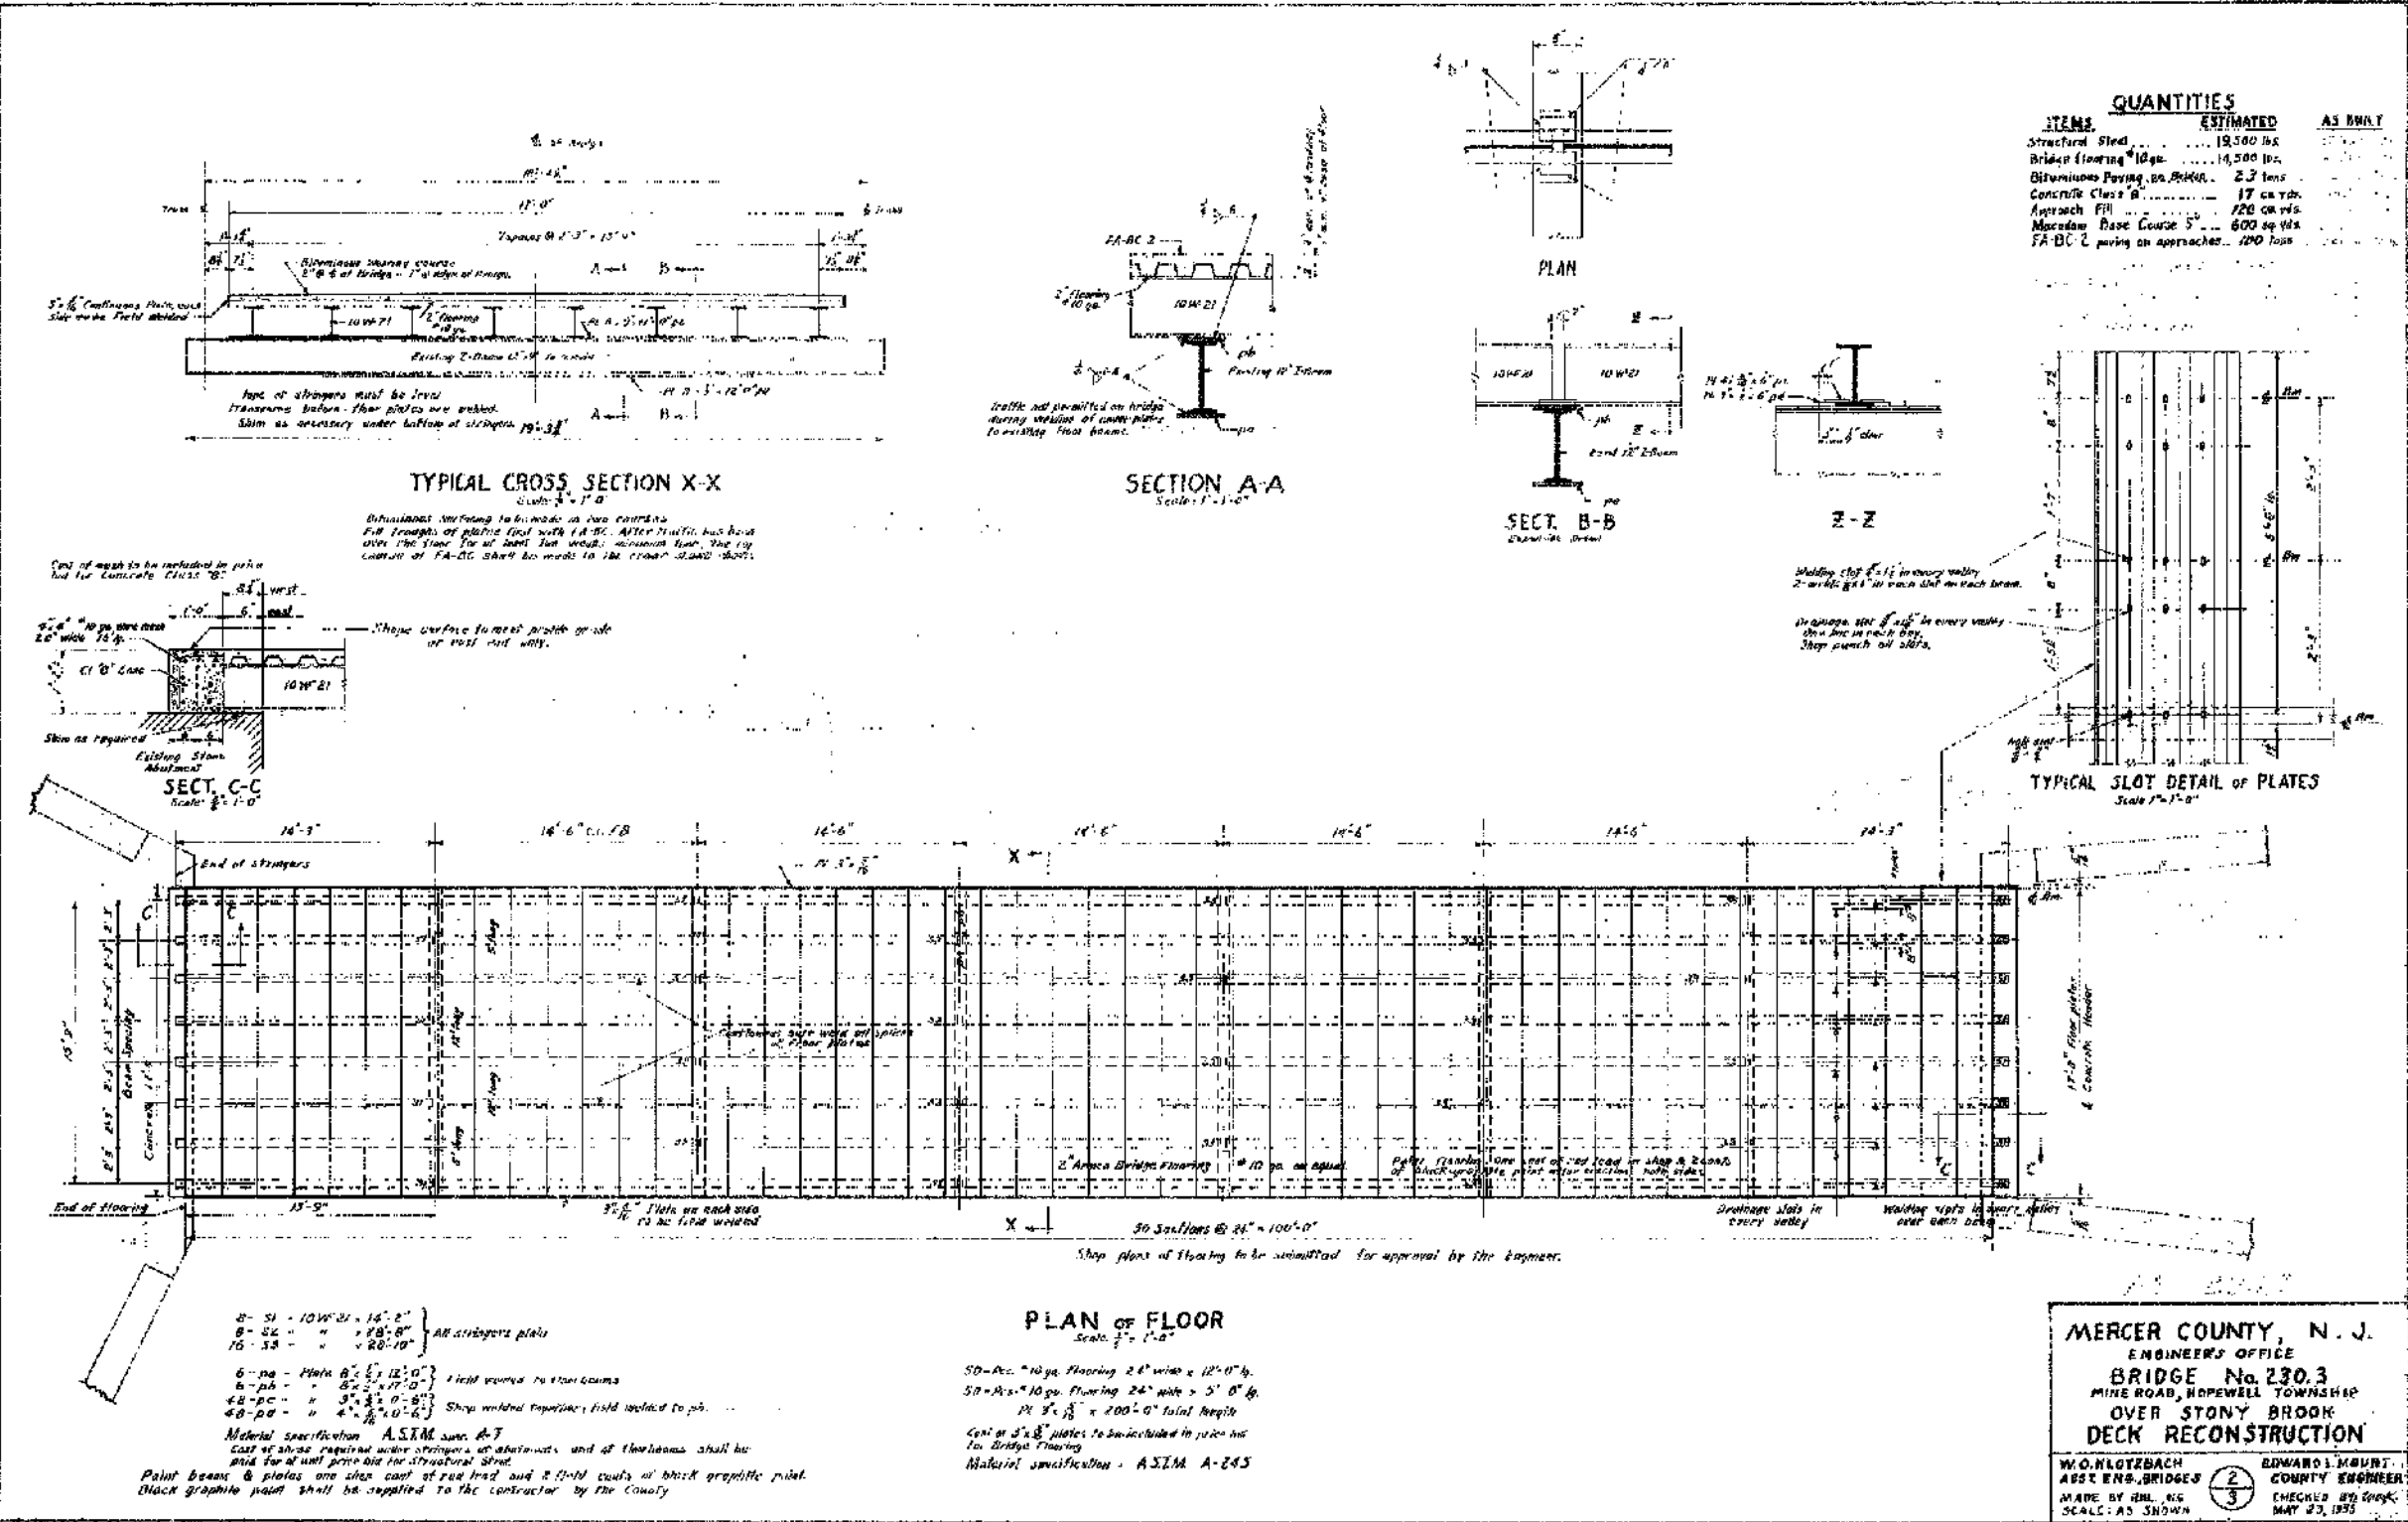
1955 As-built plans for the Bridge 230.3 deck reconstruction (Source: Mercer County Division of Engineering Office 1955).
